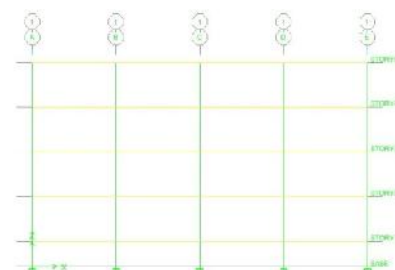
Model -1 Elevation (4 Storey-Symmetrical)
